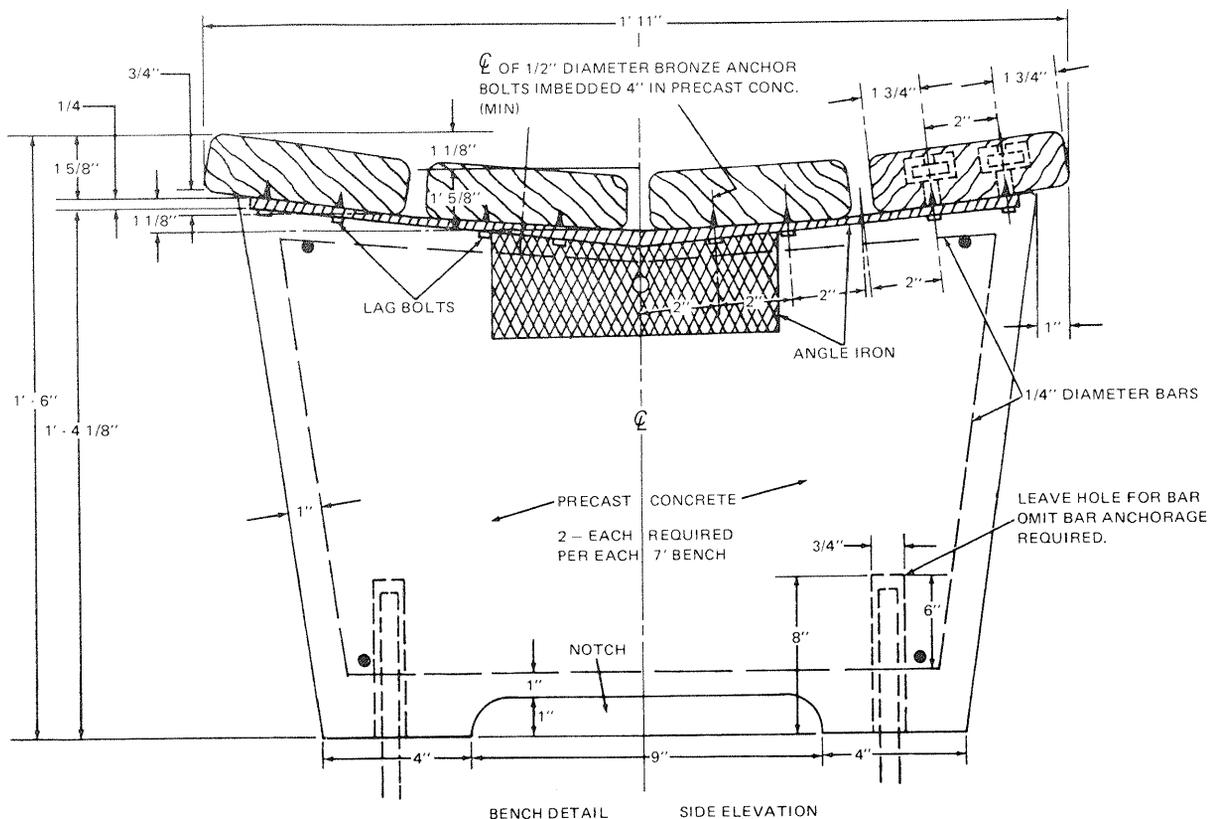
Campus bench using four 1 5/8- by 5 1/2- by 84-in. red oak or hickory slats on concrete legs. The slats are lag bolted from the bottom to an angle iron attached to concrete legs at each end of the bench. The concrete legs have a concave shape on the top so that each slat is pitched slightly from the horizontal plane. This prevents water from standing on the slat and thus helps in drying.
